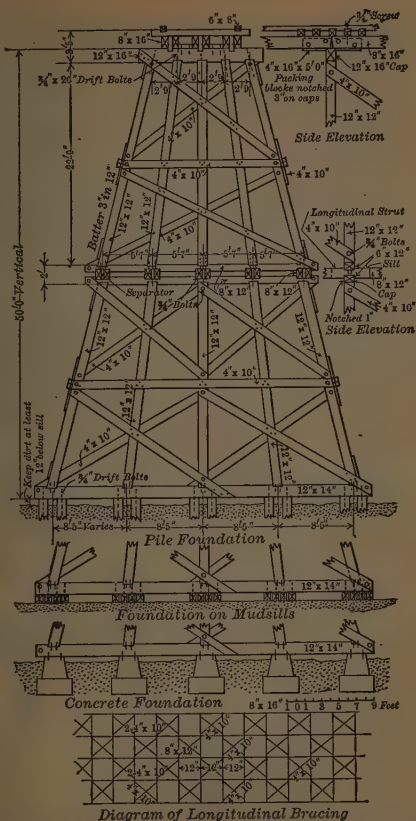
High Trestle, New York, New Haven and Hartford R. R.
